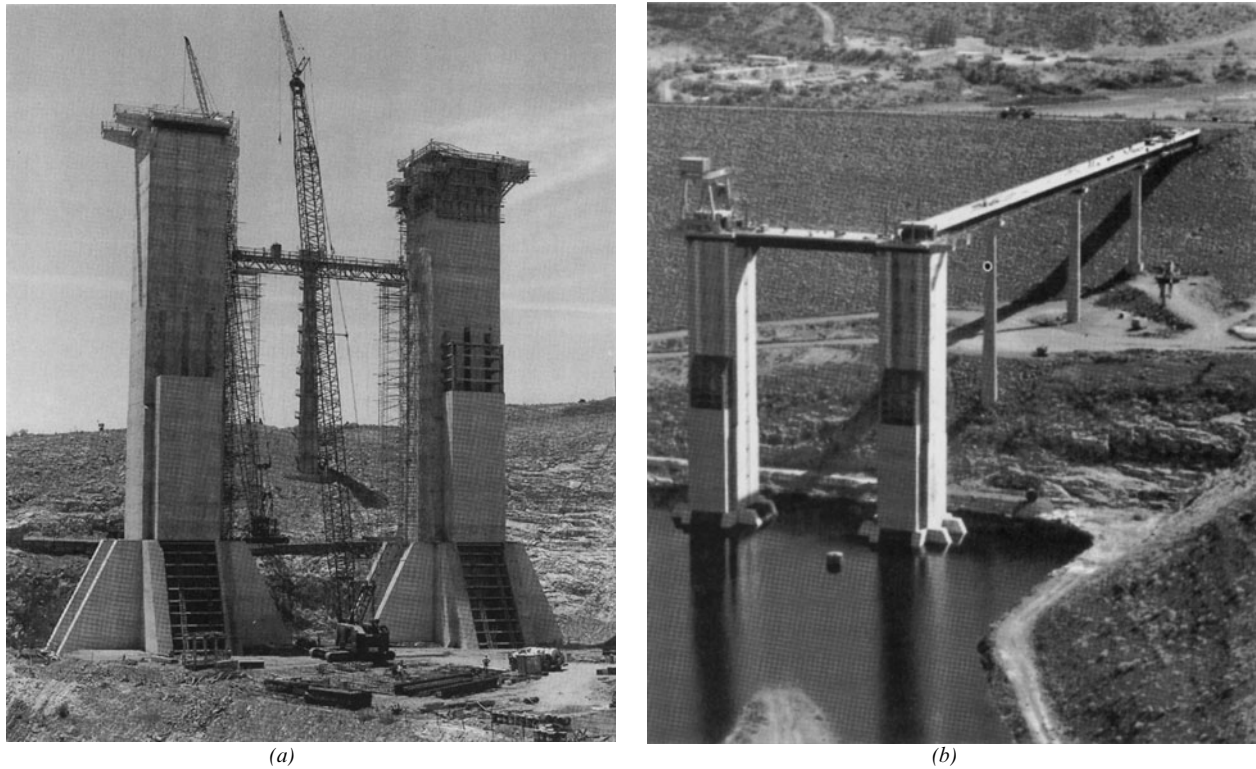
Photos of outlet structure at New Waddell Dam. (a) Structures under construction; (b) Prior to filling of Lake Pleasant. (Courtesy Central Arizona Project.)
